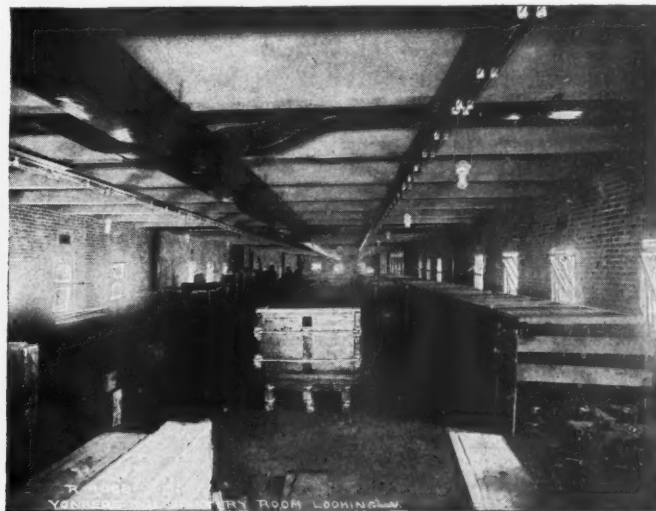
Battery Floor, Looking West; Yonkers Power House.
